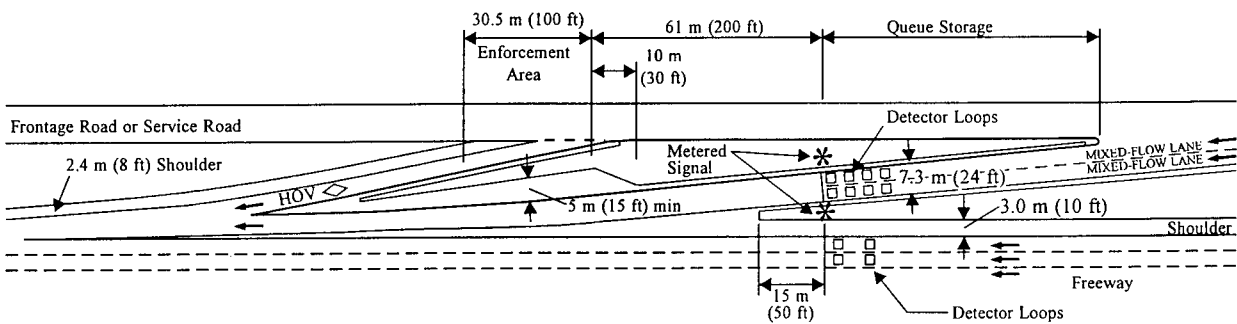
Example of Layout for Separate HOV Ramp on Metered Freeway
